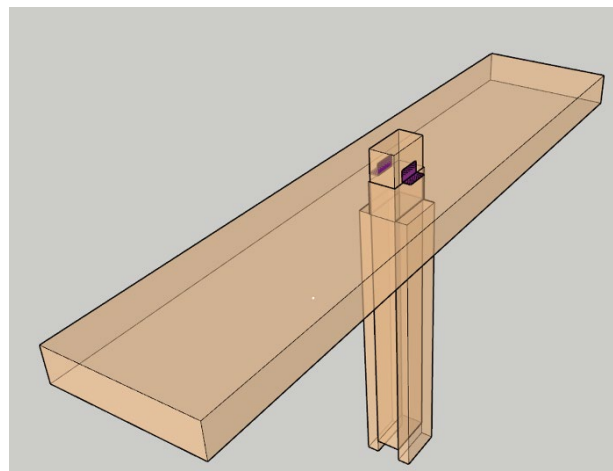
XLam's Band Beam System Column Connection (Image credit: XLam)
